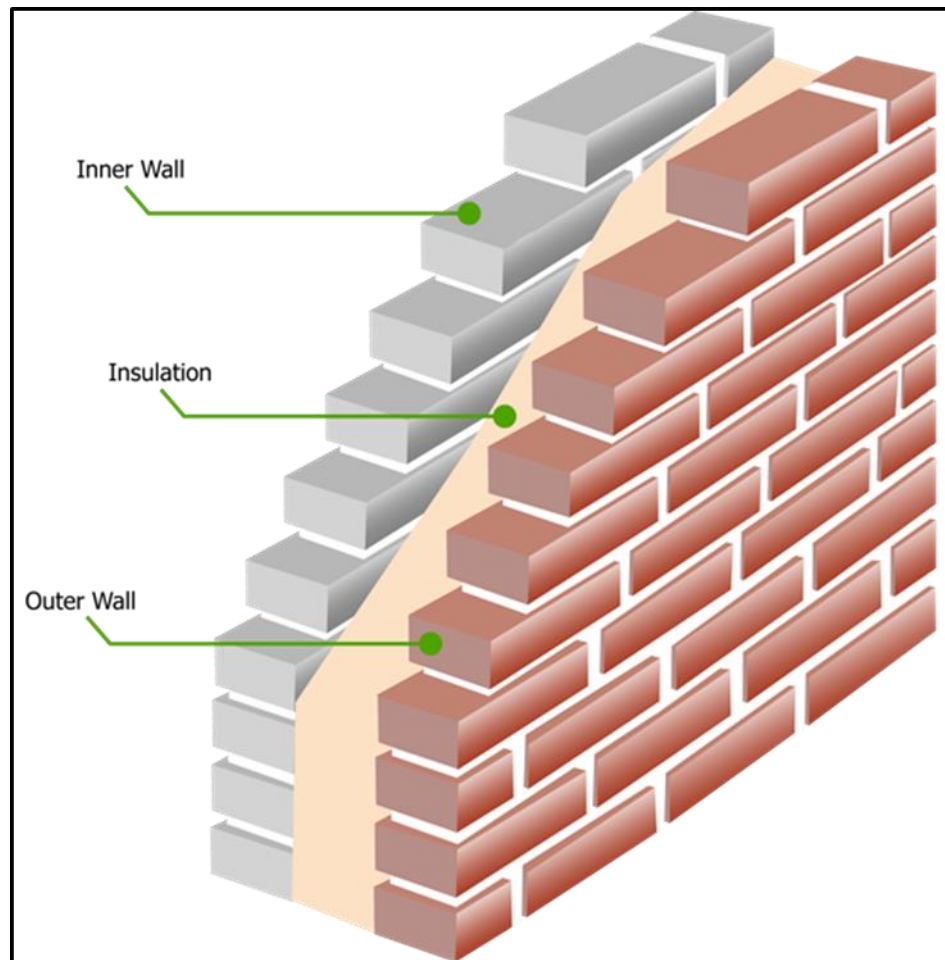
Block and brick cavity wall. [Adopted from (Firstcall 2014).]
